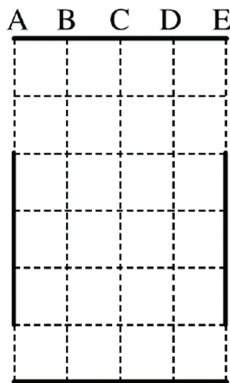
Baseline SDC B_{\max} steel moment frame building typical 3-story plan.
